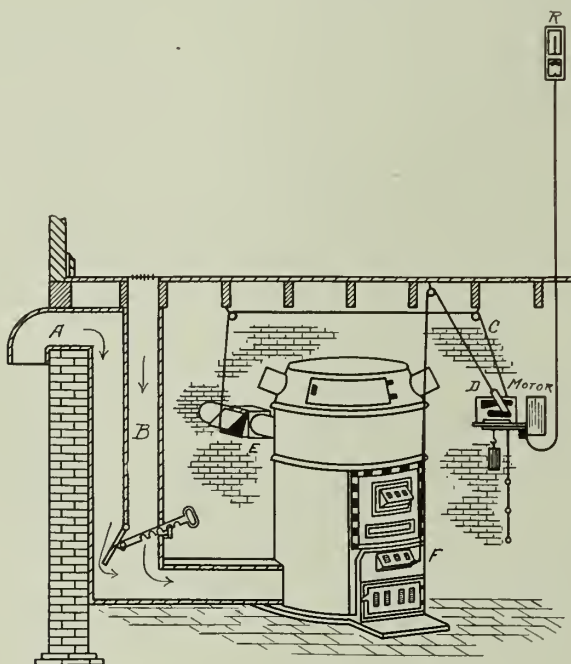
Thermostat motor connected with the dampers of a hot-air furnace.
